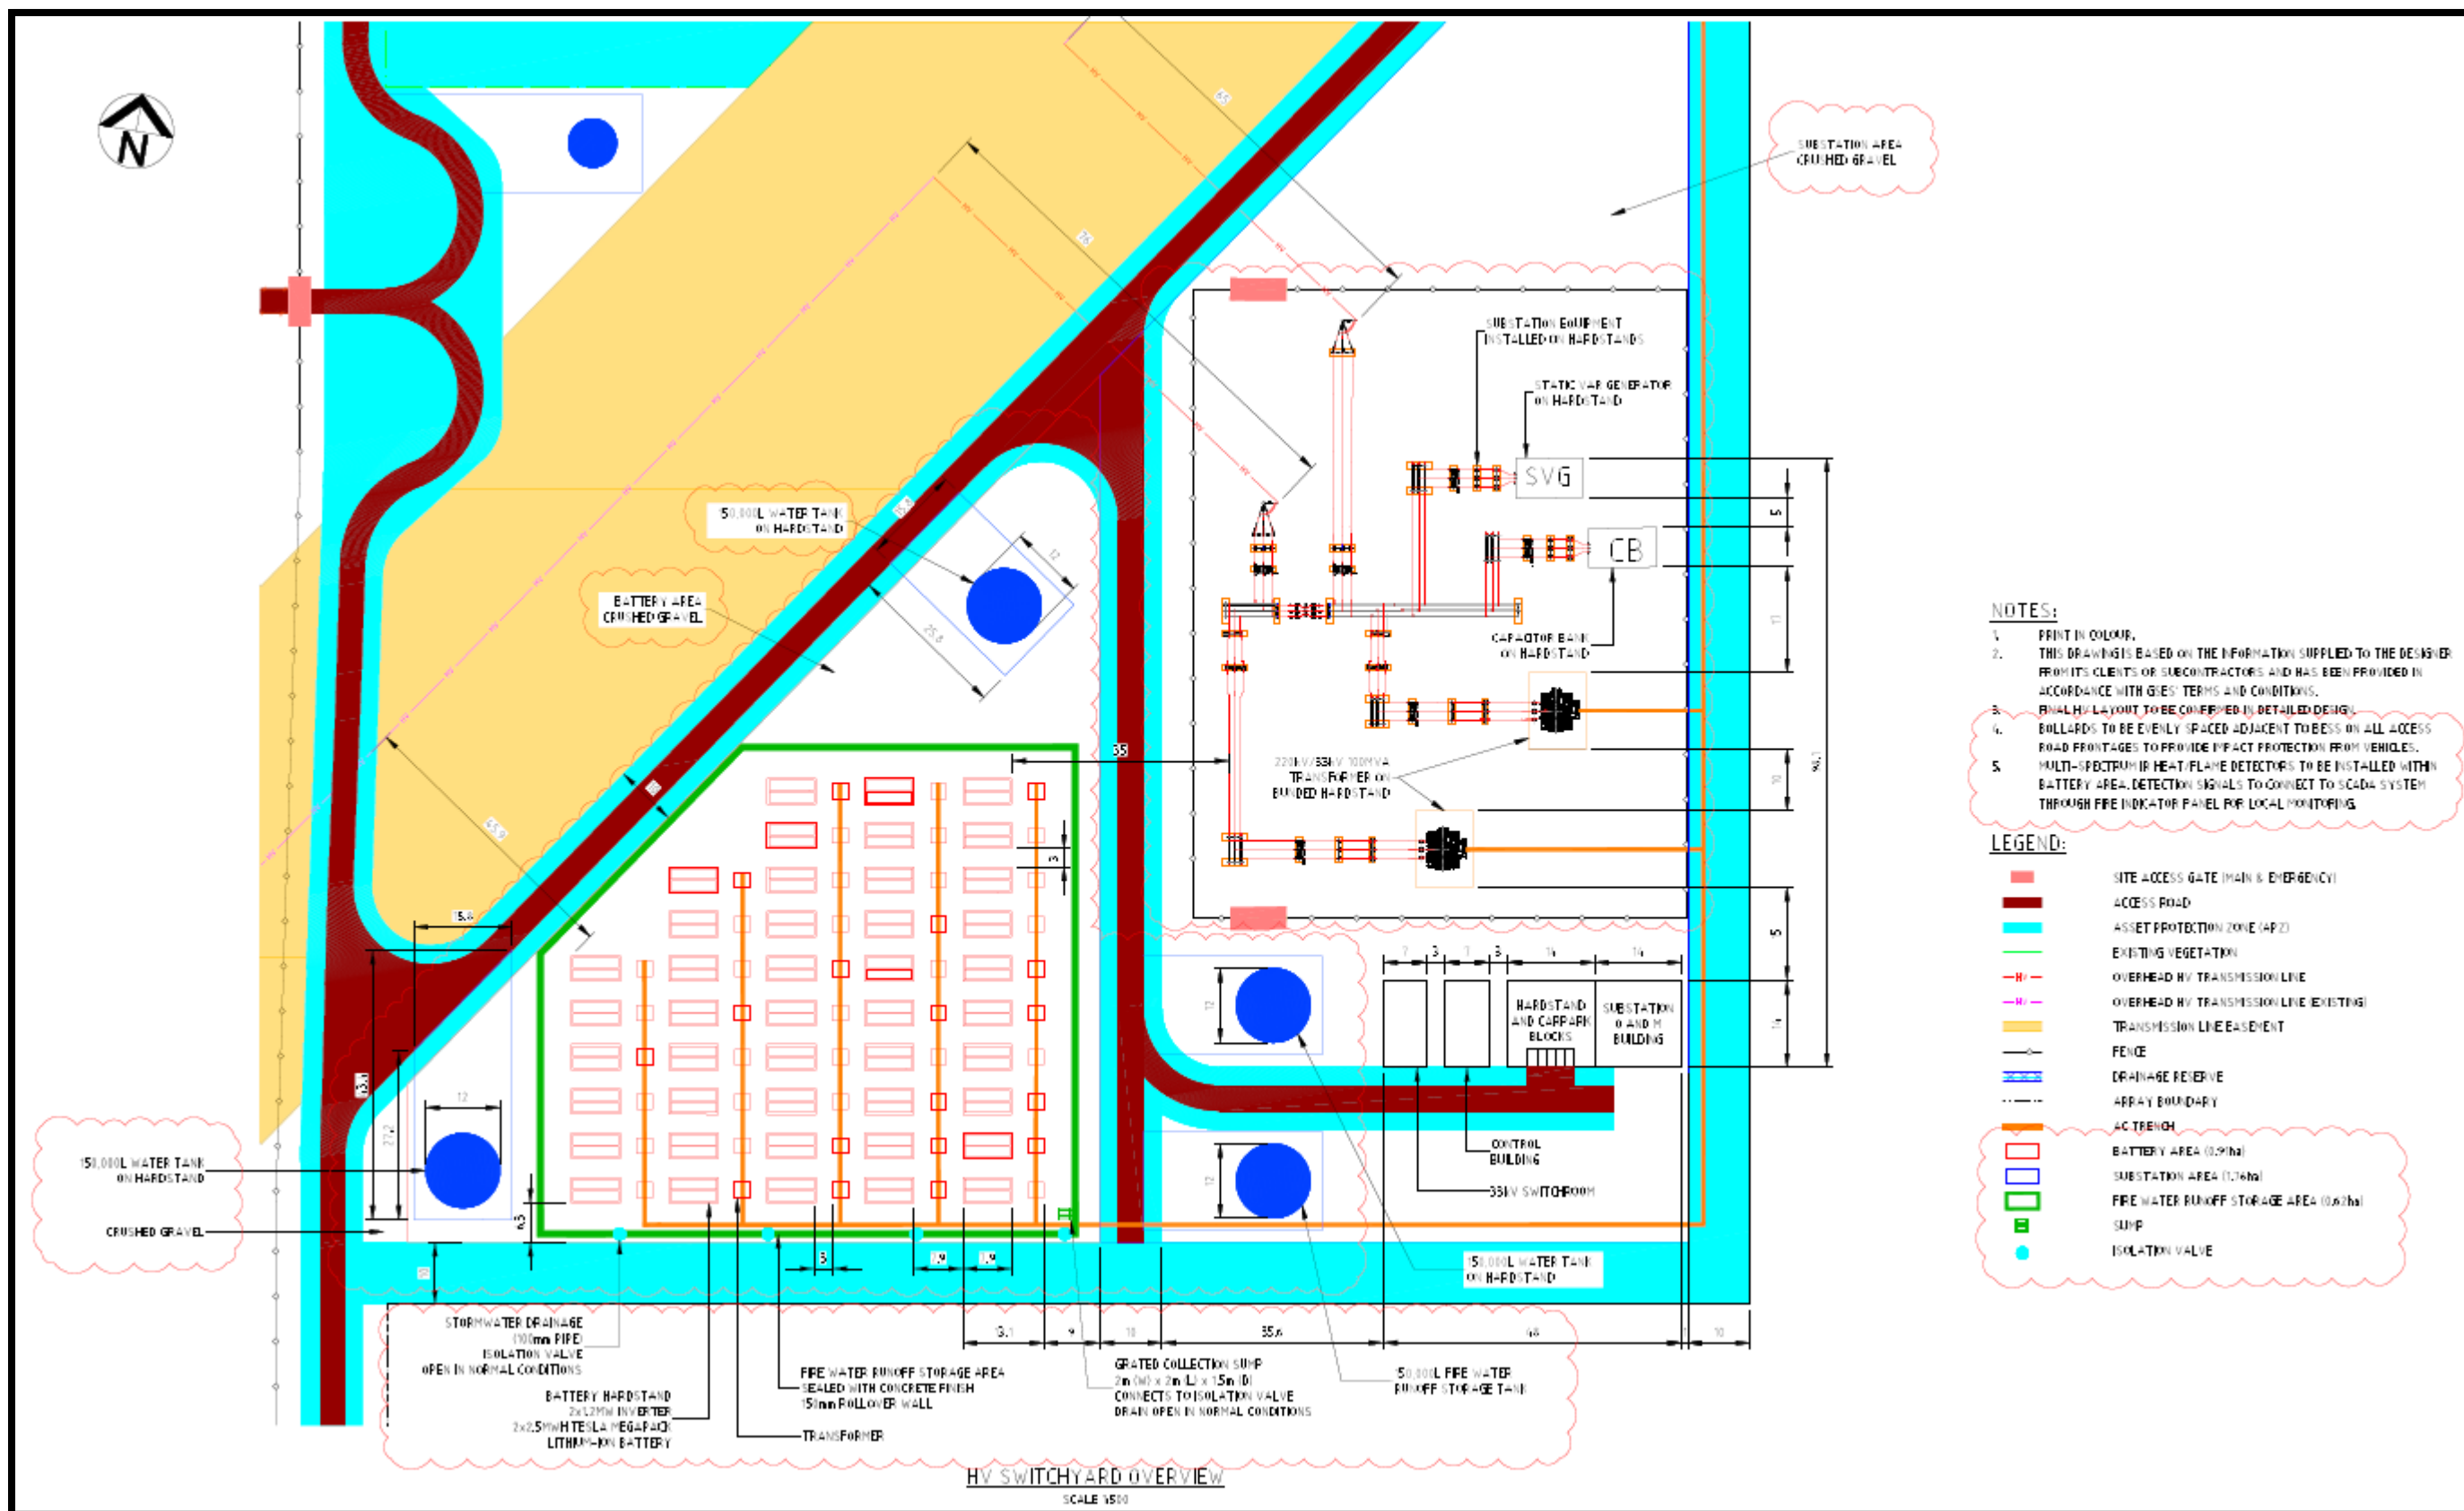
Proposed Bookaar Solar Energy Facility – Site plan (See the 'Site Plan' that accompanies the planning application for a scaled version)
